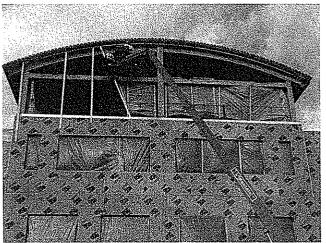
Closing in the 4<sup>th</sup> floor; view north of the building segment F south elevation. January 3, 2011.
